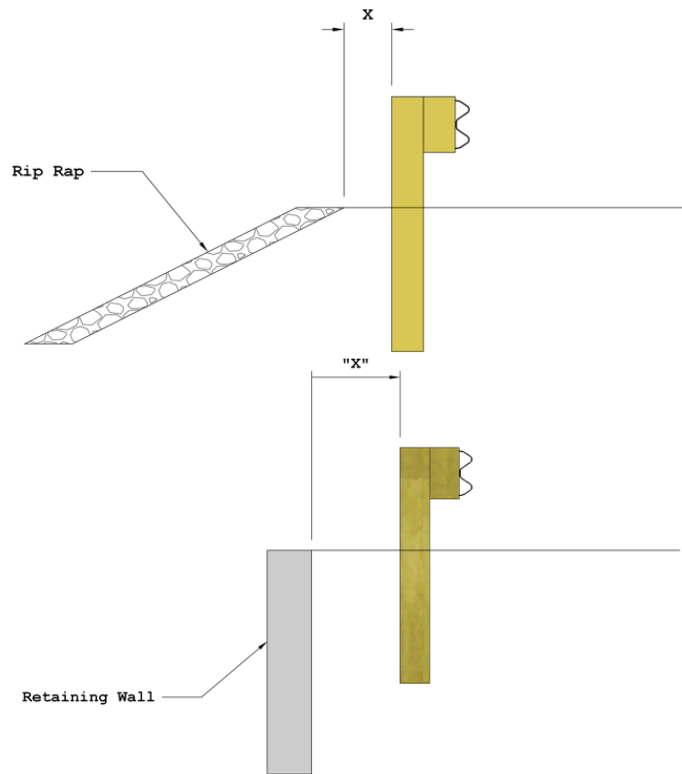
Example of Retaining Wall and Rip Rap Installed Adjacent to Guardrail.
